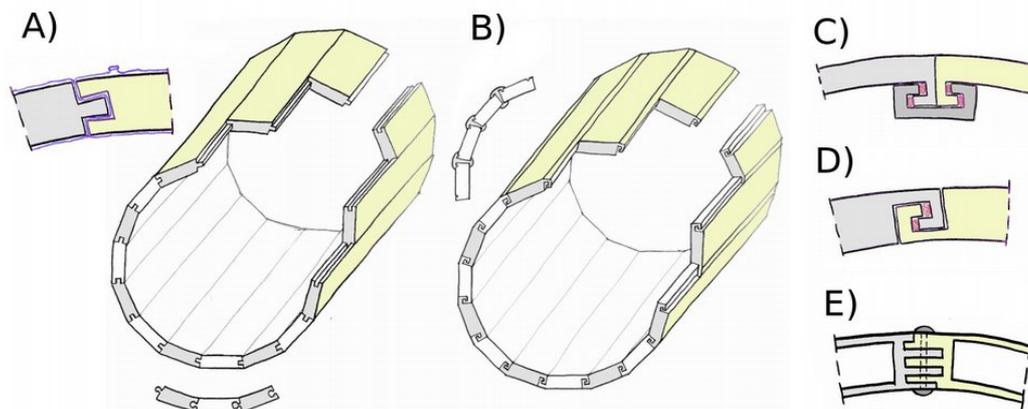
Metal constructions plans: packed and after being assembled: A) one-element module , B) detachable module, C) hybrid module, D) assembled multi-element construction, E) skeletal structure construction
